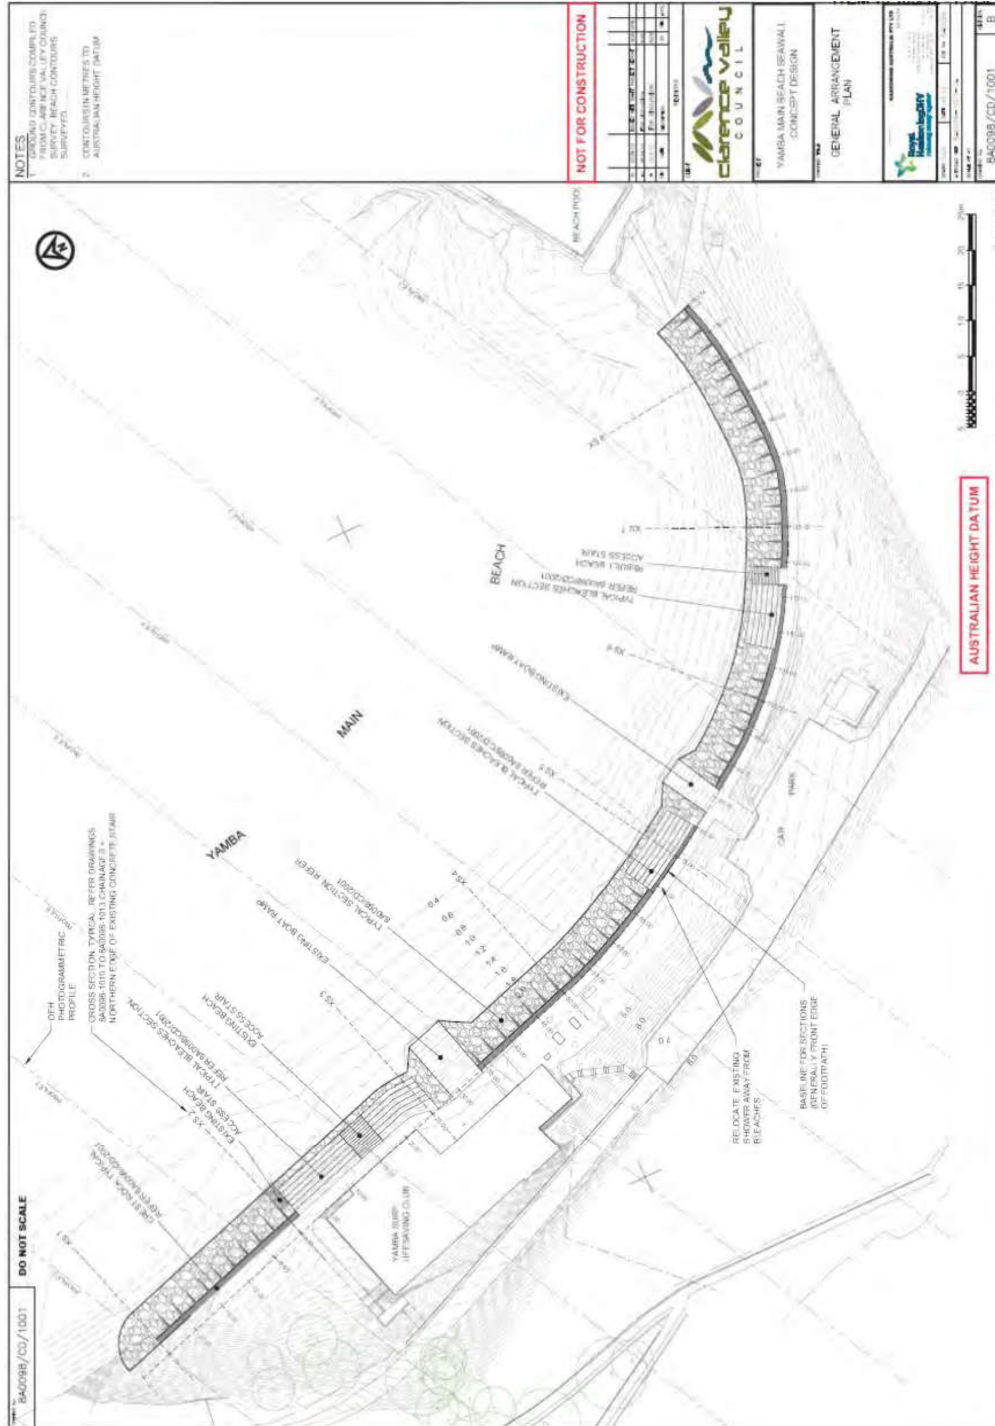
Yamba Main Beach seawall replacement - general arrangement plan
